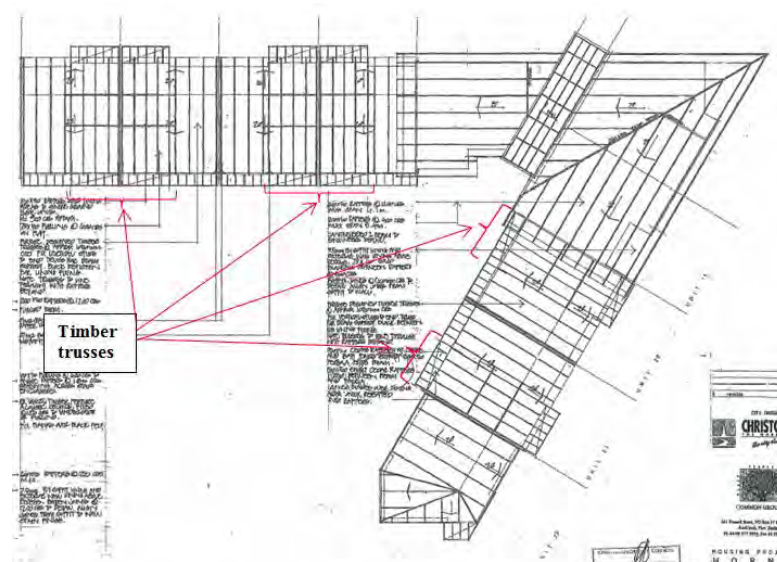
Portions of the Building with Timber Trusses at the Roof Level
